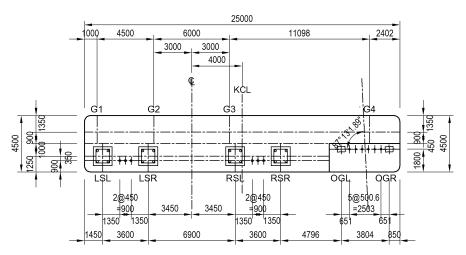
Layout of Bridge Seat for P4, P21~P23
